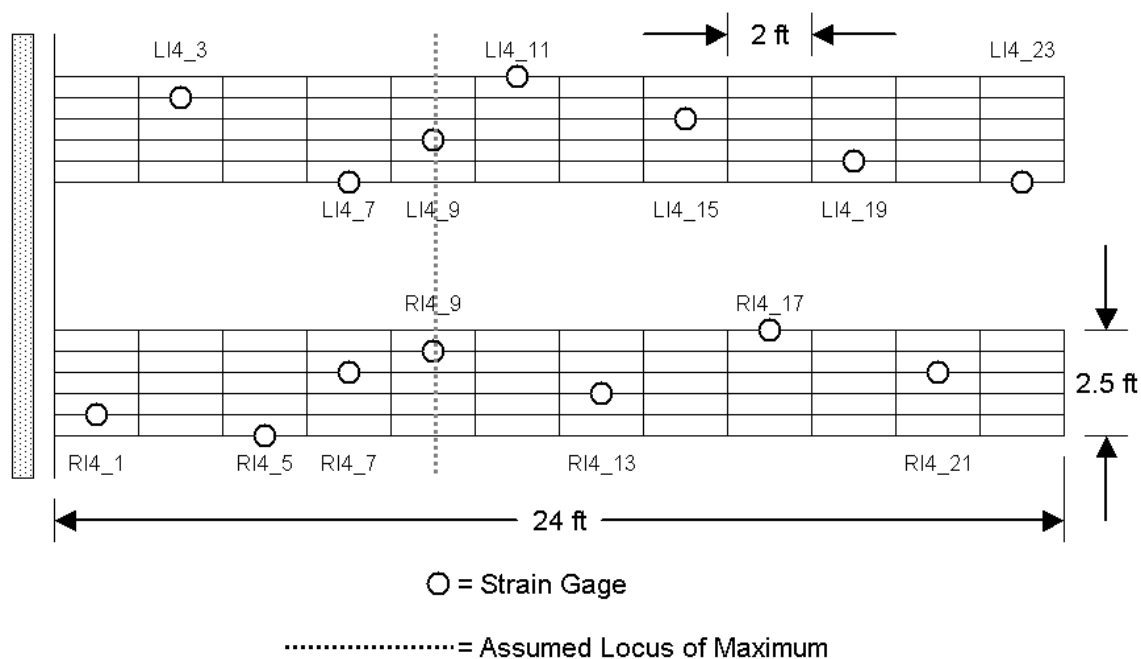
Plan view of instrumented primary bar mat IL4 at level 4 located in the intermediate and primary reinforced section.
